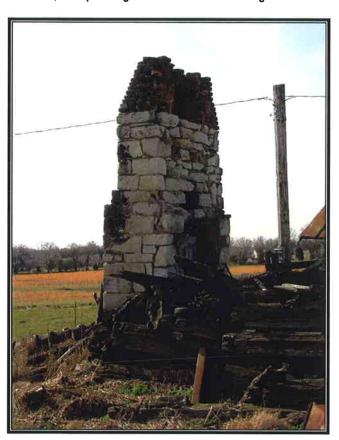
Site 4, Stone and brick chimney associated with collapsed log structure.
